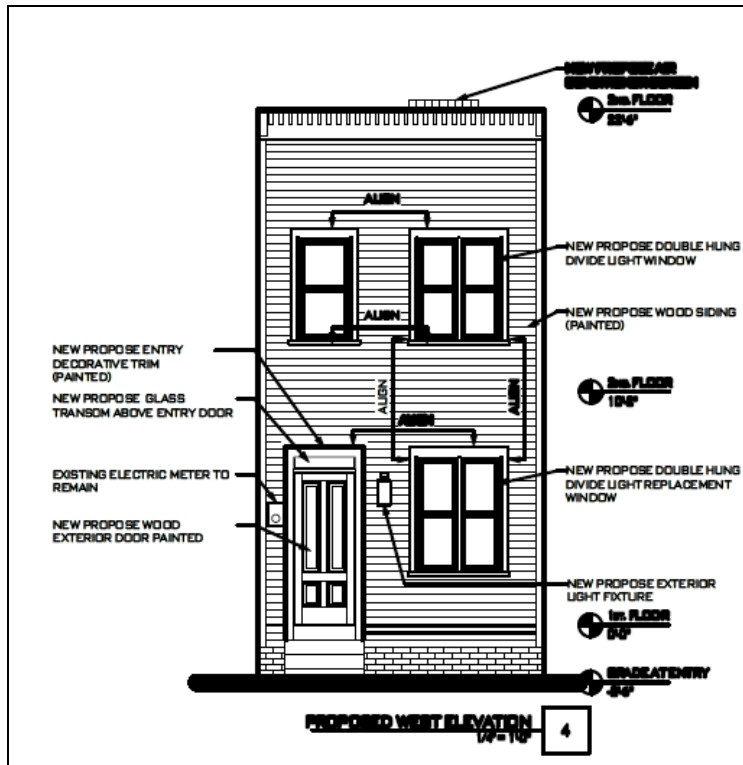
Previously proposed west elevation for BAR Case # 2008-0149 (Paired window on second floor not approved).
